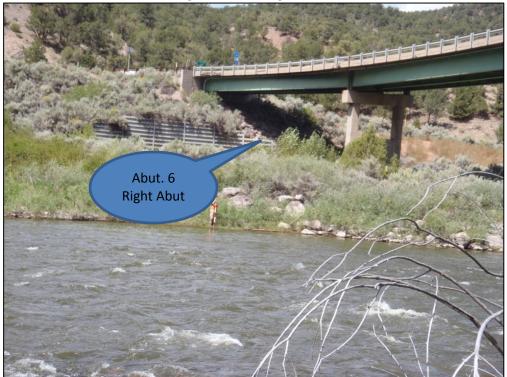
(F-06-M) Looking toward the structure entrance
